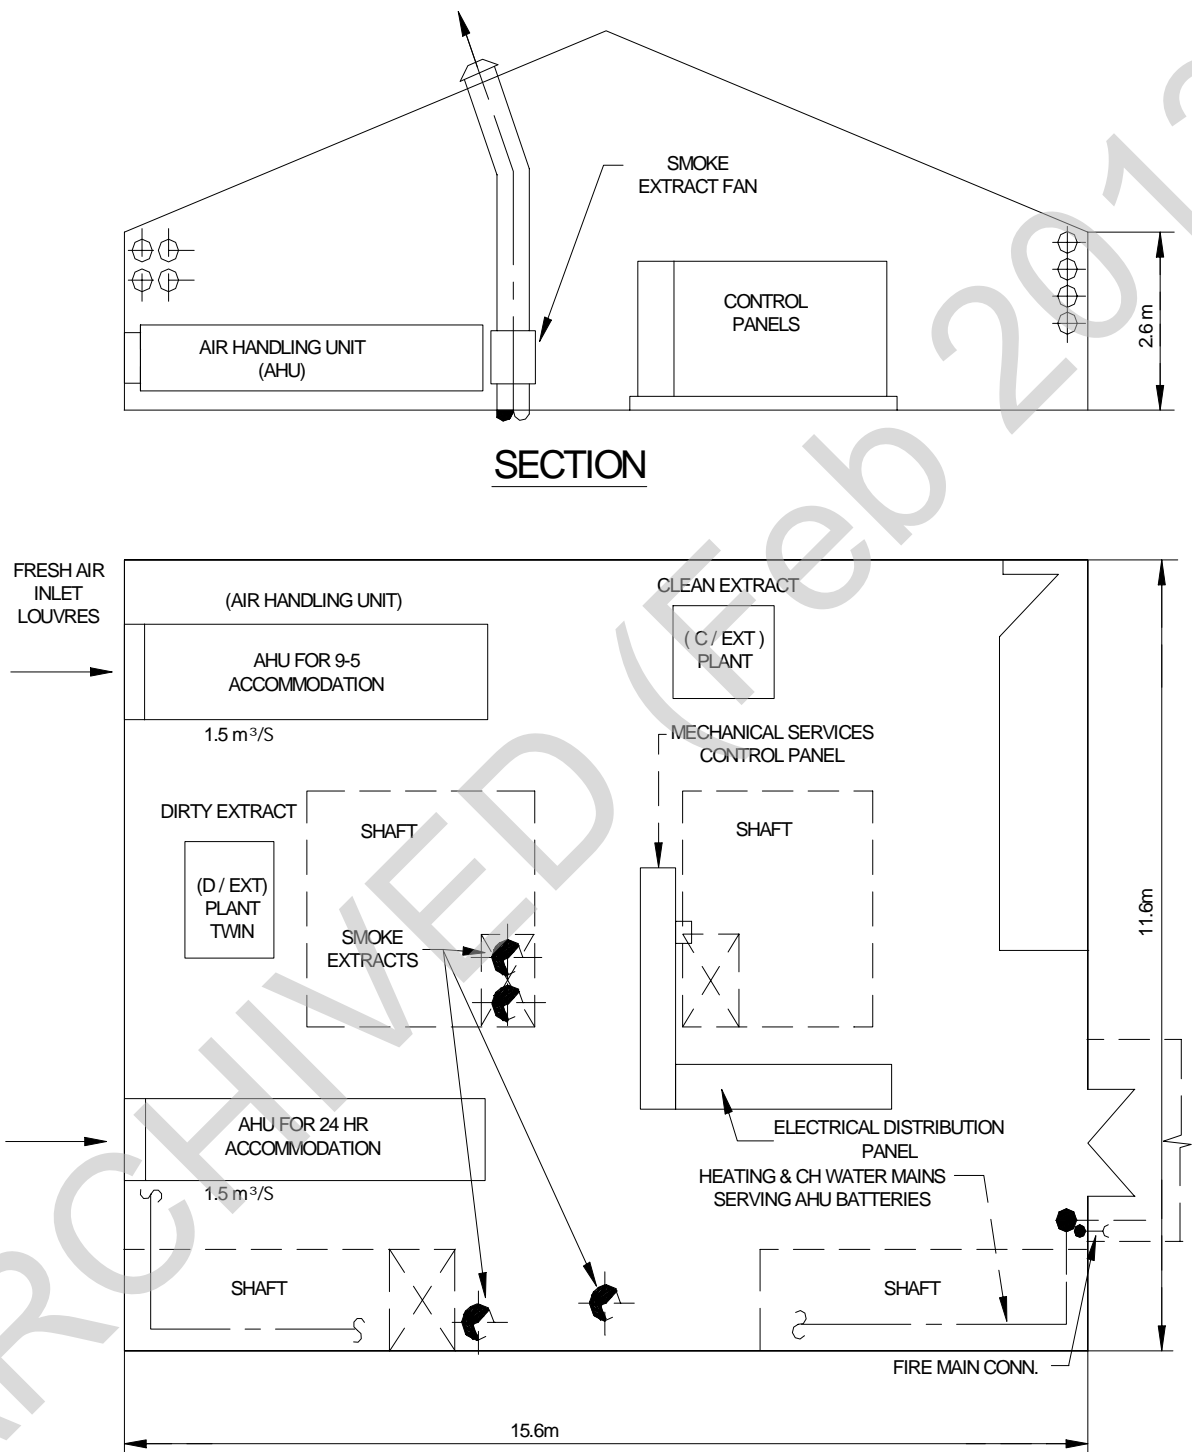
Typical plantroom 2 serving a combination of 24 hr and 9-5 accommodation departments
